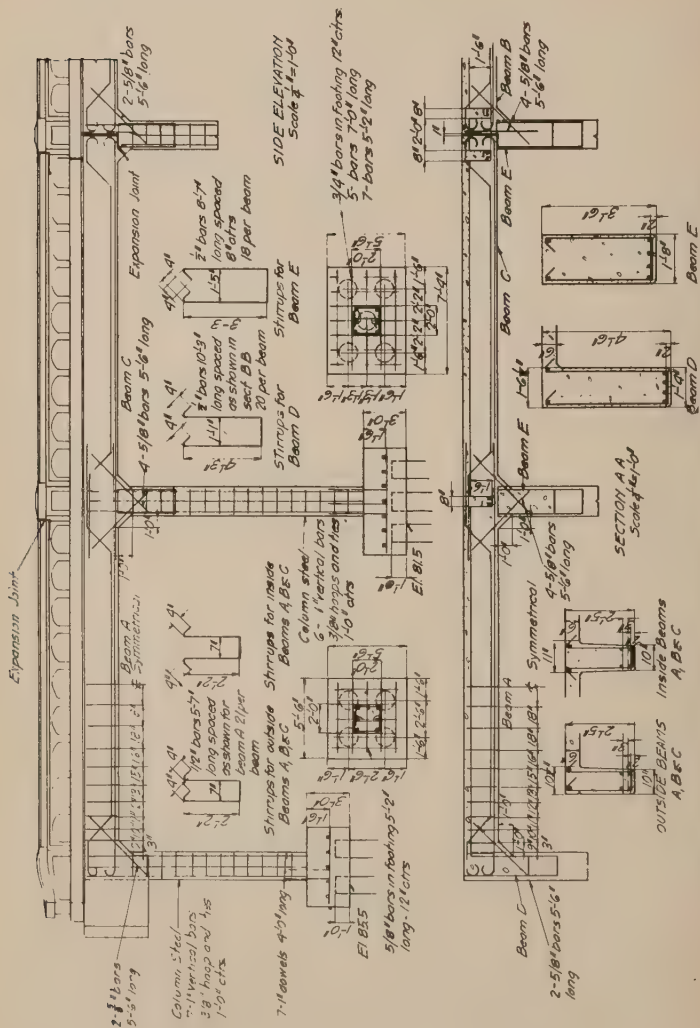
Elevation, typical R. C. multiple beam design, buried abutments.
